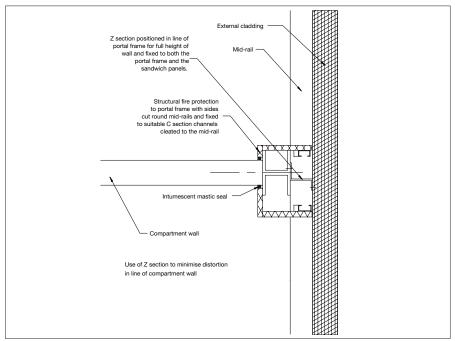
Steel framework is protected by fire-resisting boards. The Z section is fixed to the portal frame and external cladding to minimise distortion at the line of the compartment wall
